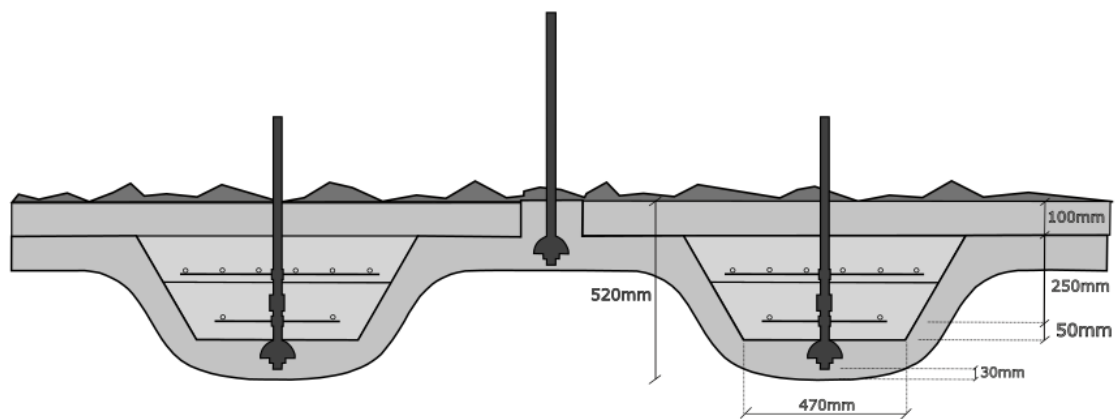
Drawing of the cross section for reinforced shotcrete arches as general support for rock class four and span class B and C (Lesell, 2016) (modified by the author).
